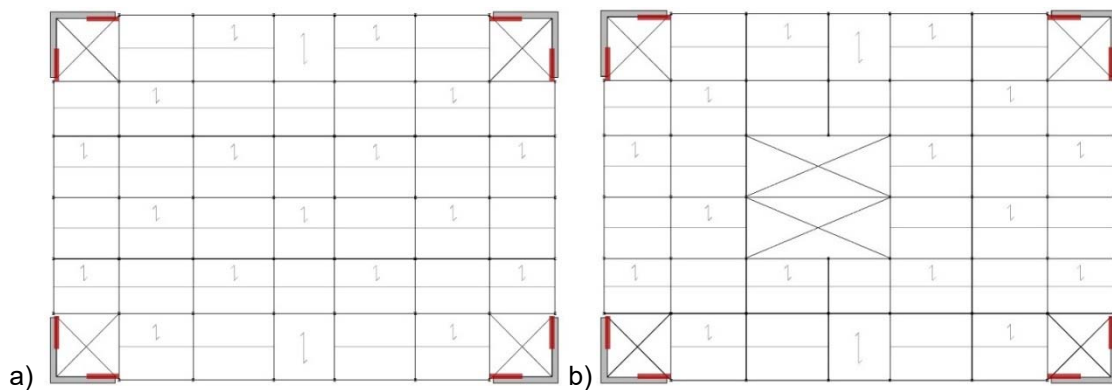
Typical plan dispositions: a) P1, b) P2 and P3.
